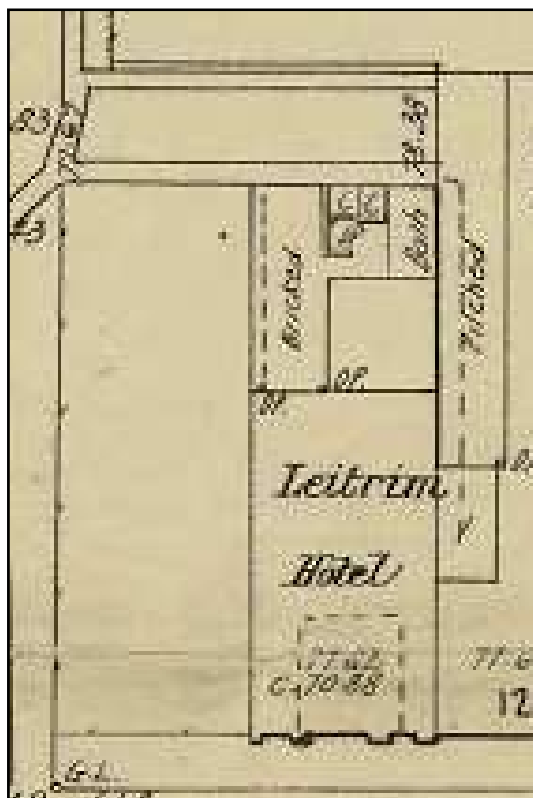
MMBW Detail Plan (part) 1896 showing hotel and dotted cellar with adjoining vacant lots
